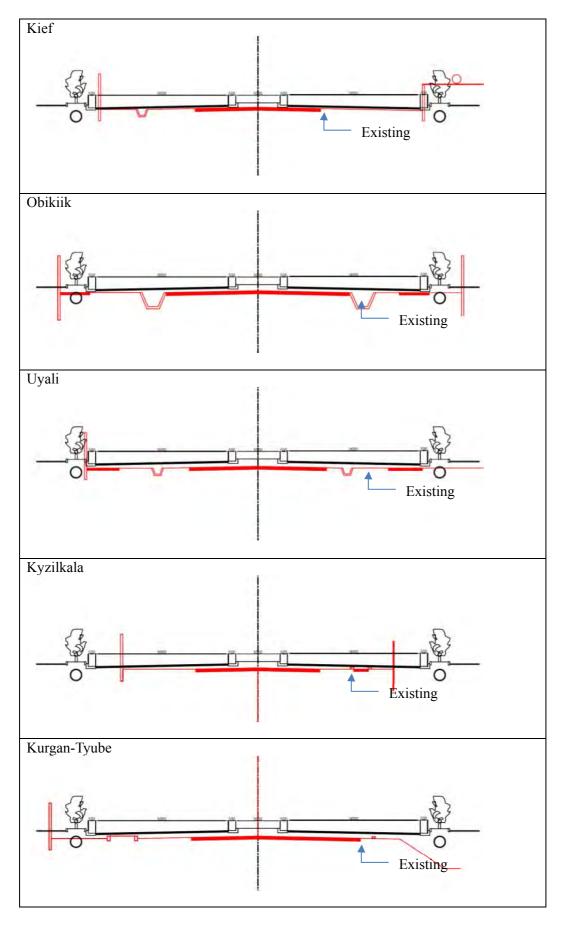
TYPICAL CROSS SECTION OF URBAN SECTION
